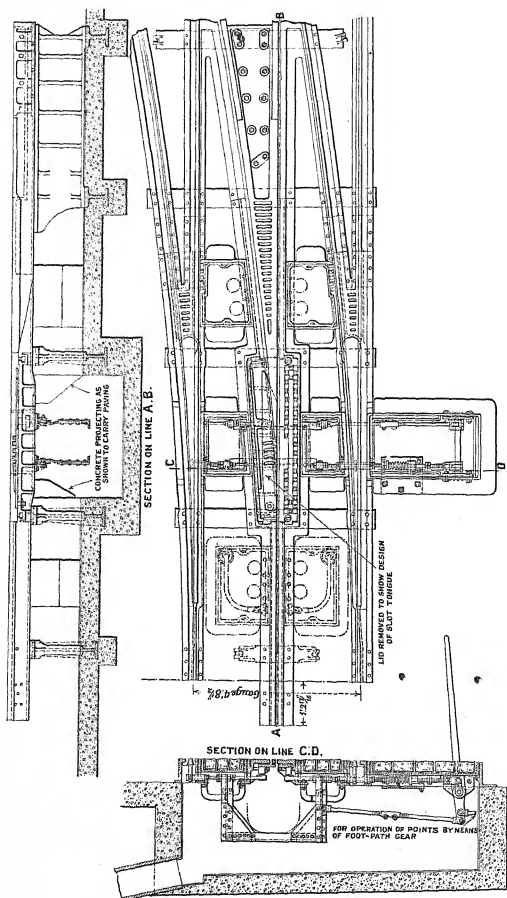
Construction of slot and rail points in L.C.C. conduit system.
